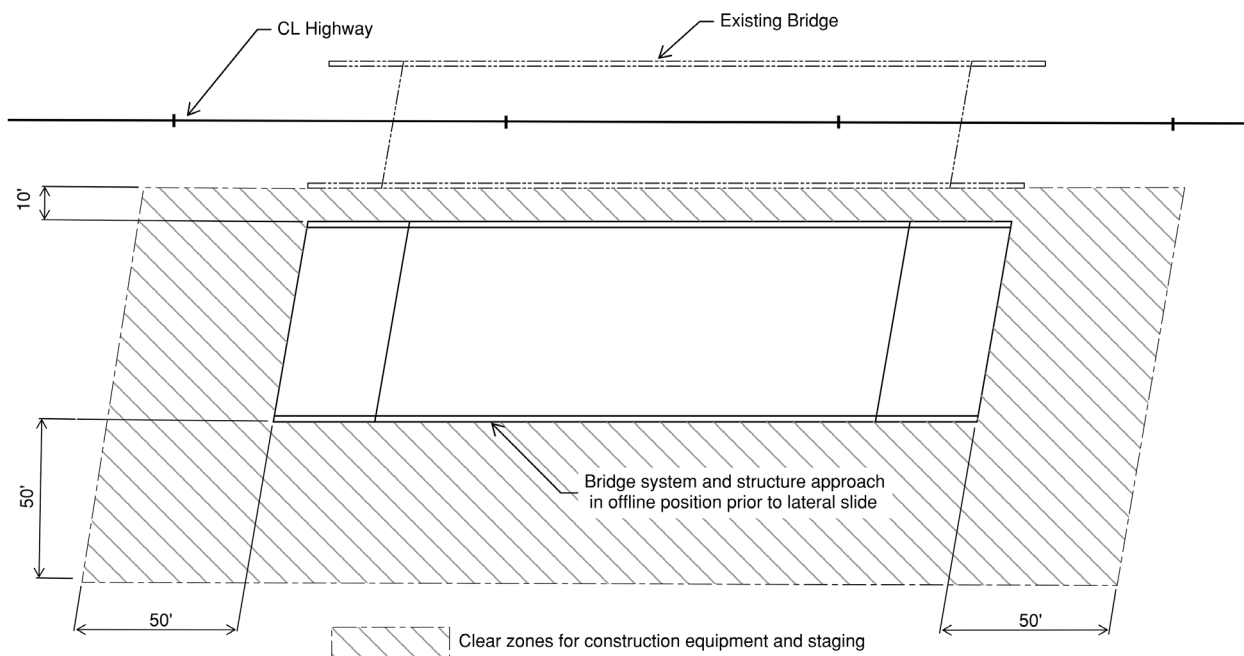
Clear Zones for Construction of Lateral Slide Bridge Systems
